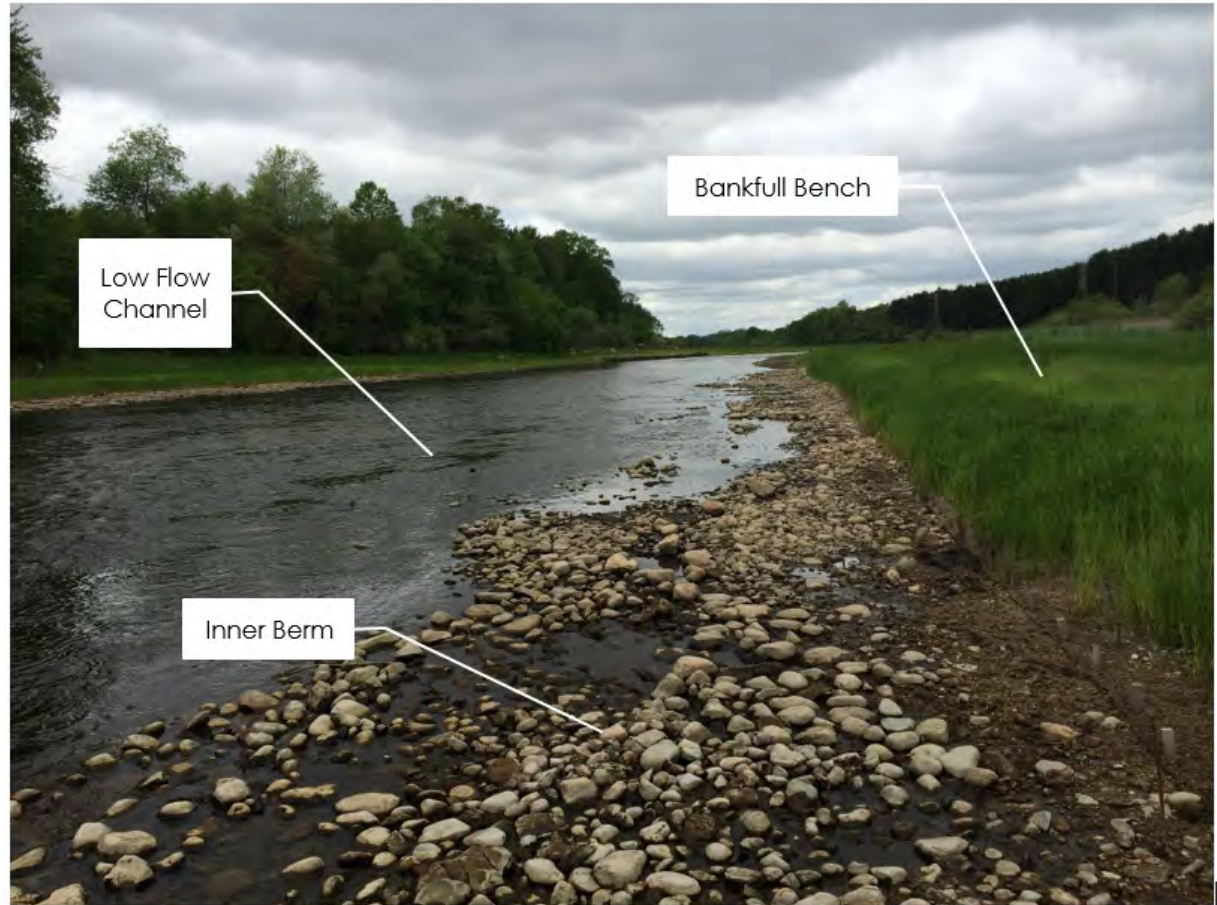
Kalamazoo River – Constructed Riffle (Post-Construction)
